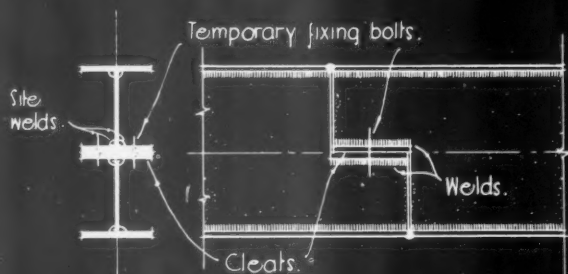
WELDING OF A SPLICED PLATE GIRDER
